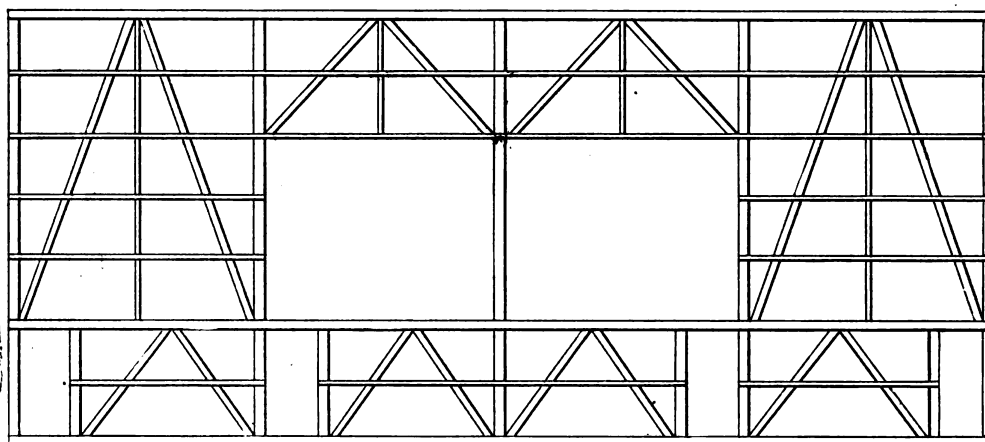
Side View of Plank Frame Barn.—Scale, 3/32 Inch to the Foot.
